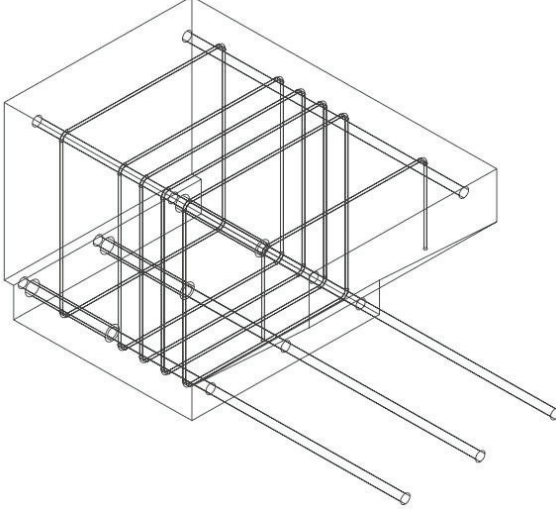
Type B specimen, Type A is similar but without stirrups in the bonded zone
